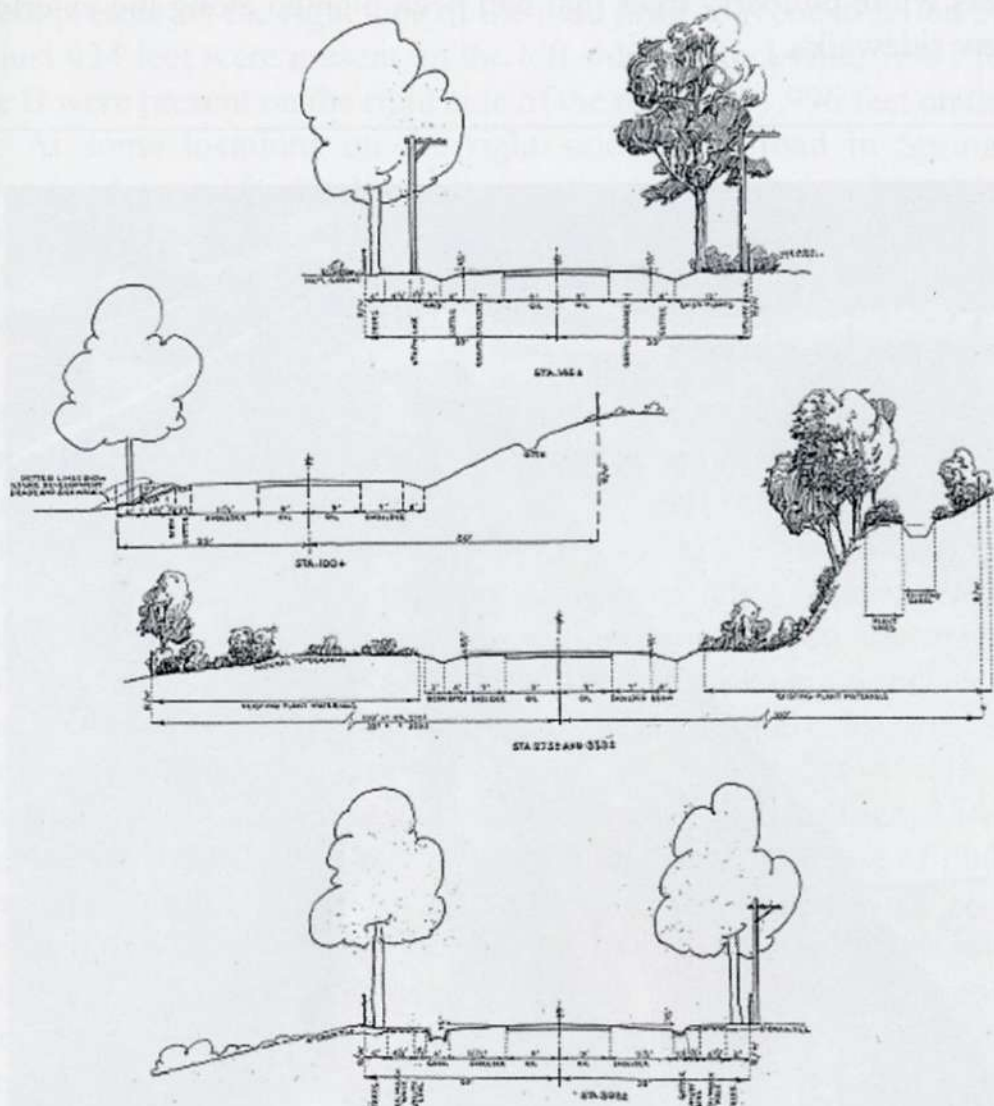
Typical project road cross sections. From the top these are: 1) a level area outside of town; 2) a moderate slope outside of town; 3) a steep area outside of town with adjacent irrigation canal; and 4) a level area in town with landscape plantings, sidewalks, a "rock canal" on the left, and "curb and gutter" on the right (USRC 1938 [sheet 81-B3 2]).
